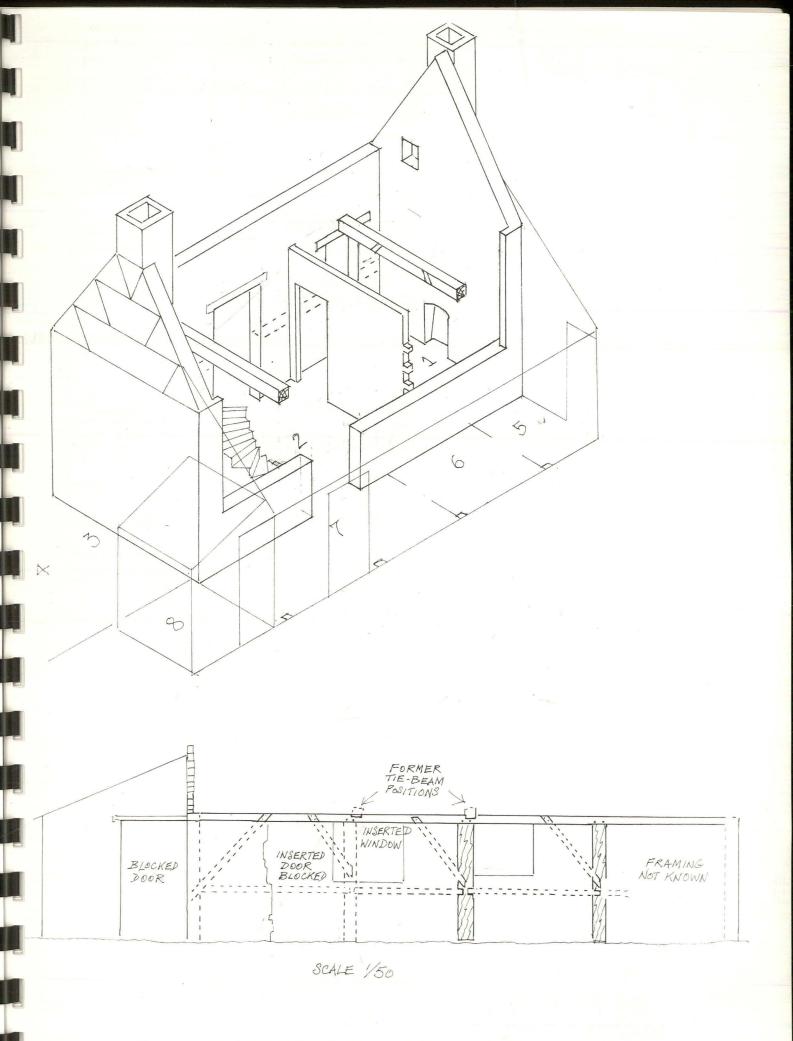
North Somercotes Cottage. a) Cut away plan showing earliest brickwork. b) Outshot north elevation
